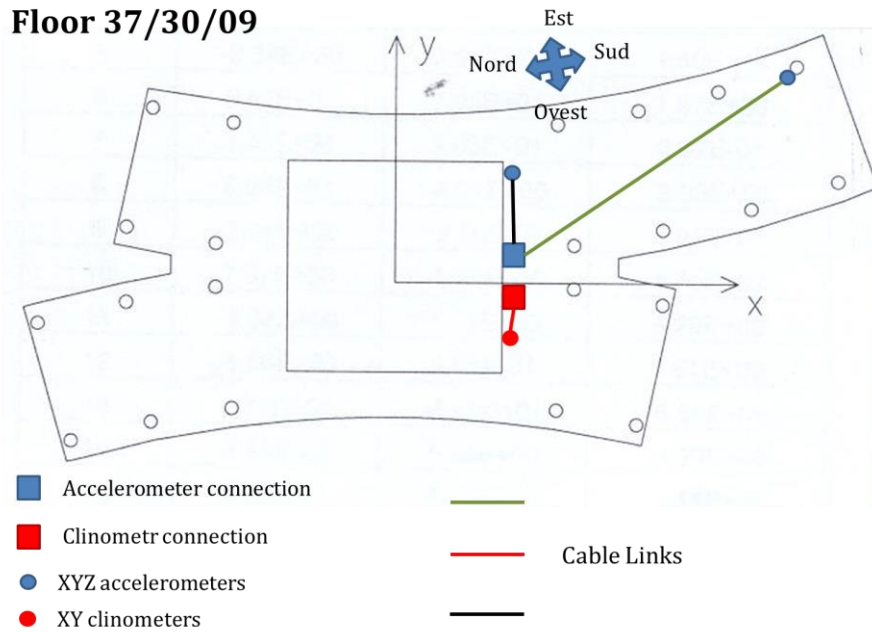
Sensor positions on floor 37/30/09, on floor B3 and on the “Velario” only the Core sensors are installed.
